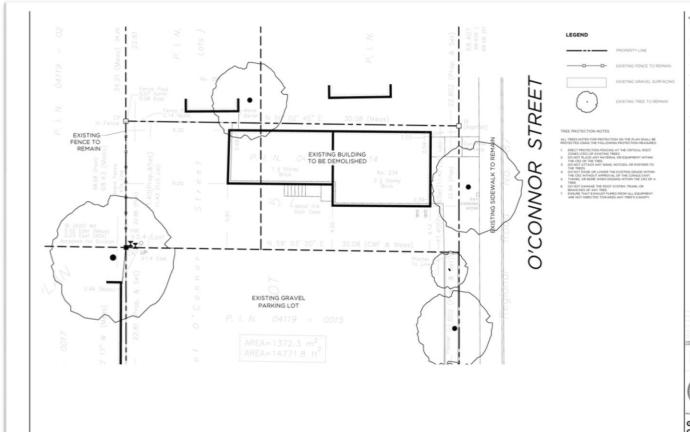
Demolition plan for the site at 234 O'Connor Street. Credit: Fotenn Consultants 2016.
